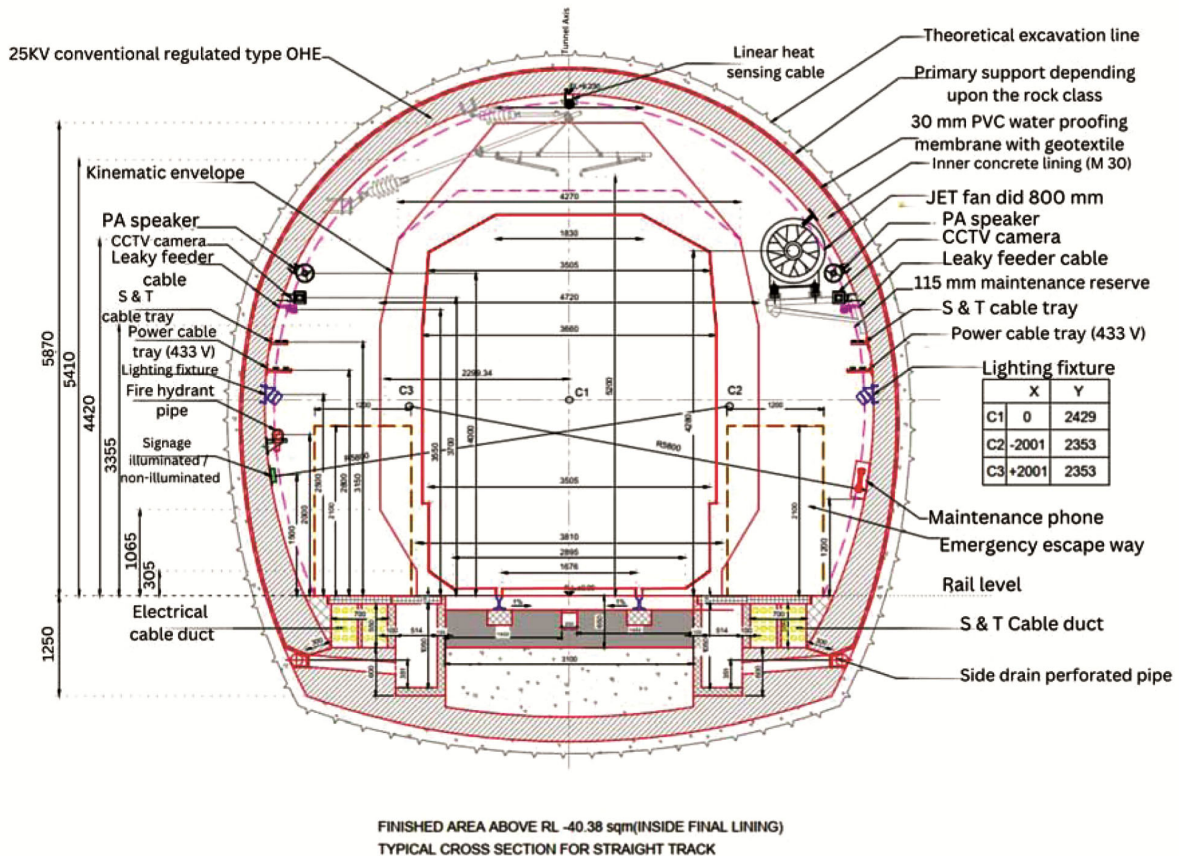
Typical cross-section of the proposed main tunnel for straight track (without invert)
